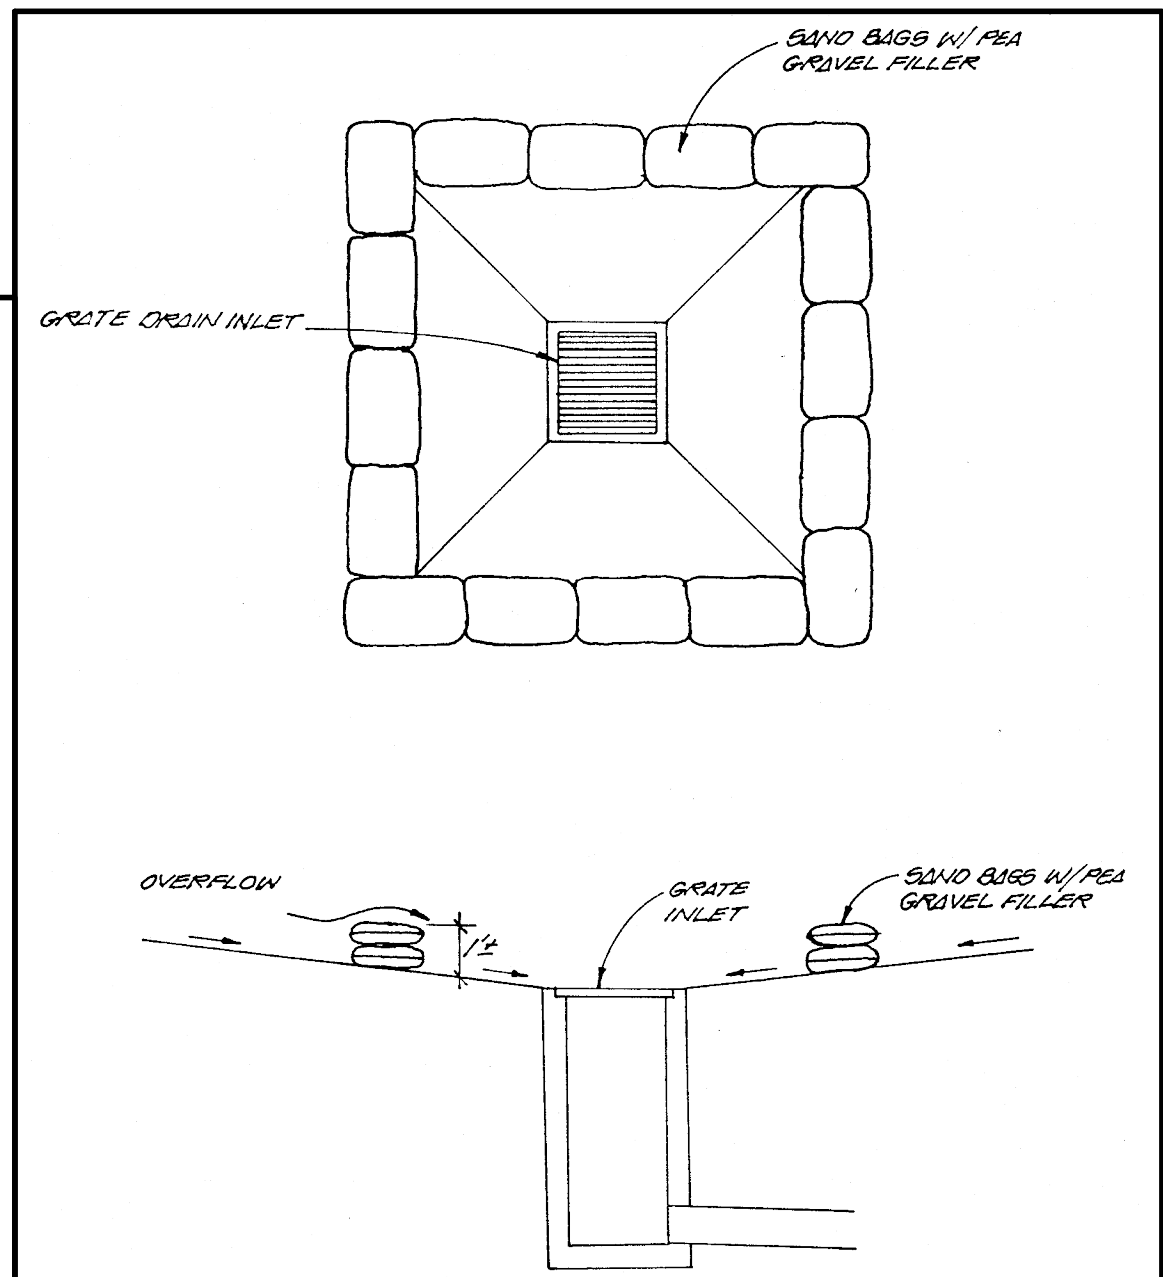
Diagram of Bagged Gravel Grate Inlet Protection (Pape-Dawson)
